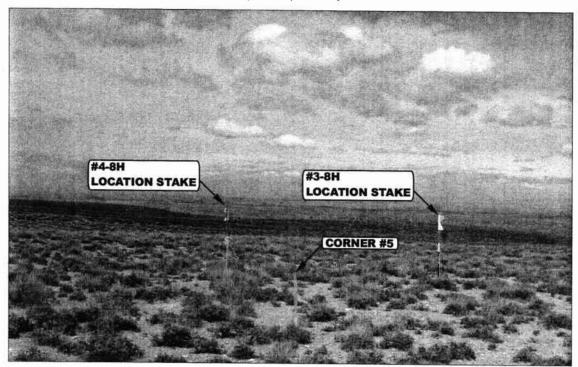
PHOTO: VIEW FROM CORNER #5 TO CORNER LOCATION STAKE
